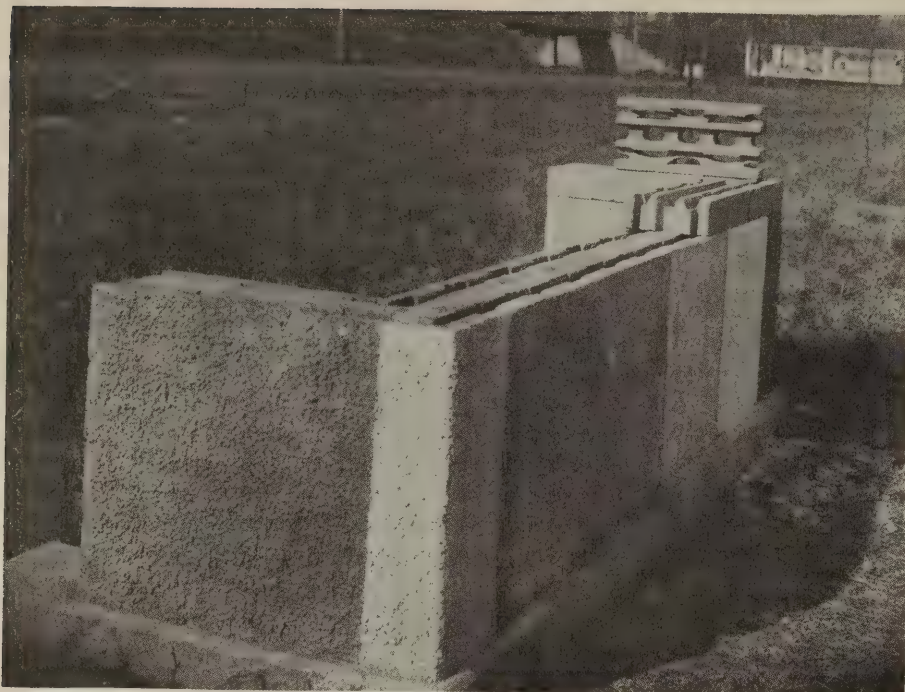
Sample of concrete block and stucco wall (picabbs type) built at Paruco Park to illustrate wall construction of houses described in the accompanying article. A number of different stucco colors and treatments are shown. A sample tile block unit is shown face up, on top of the wall
